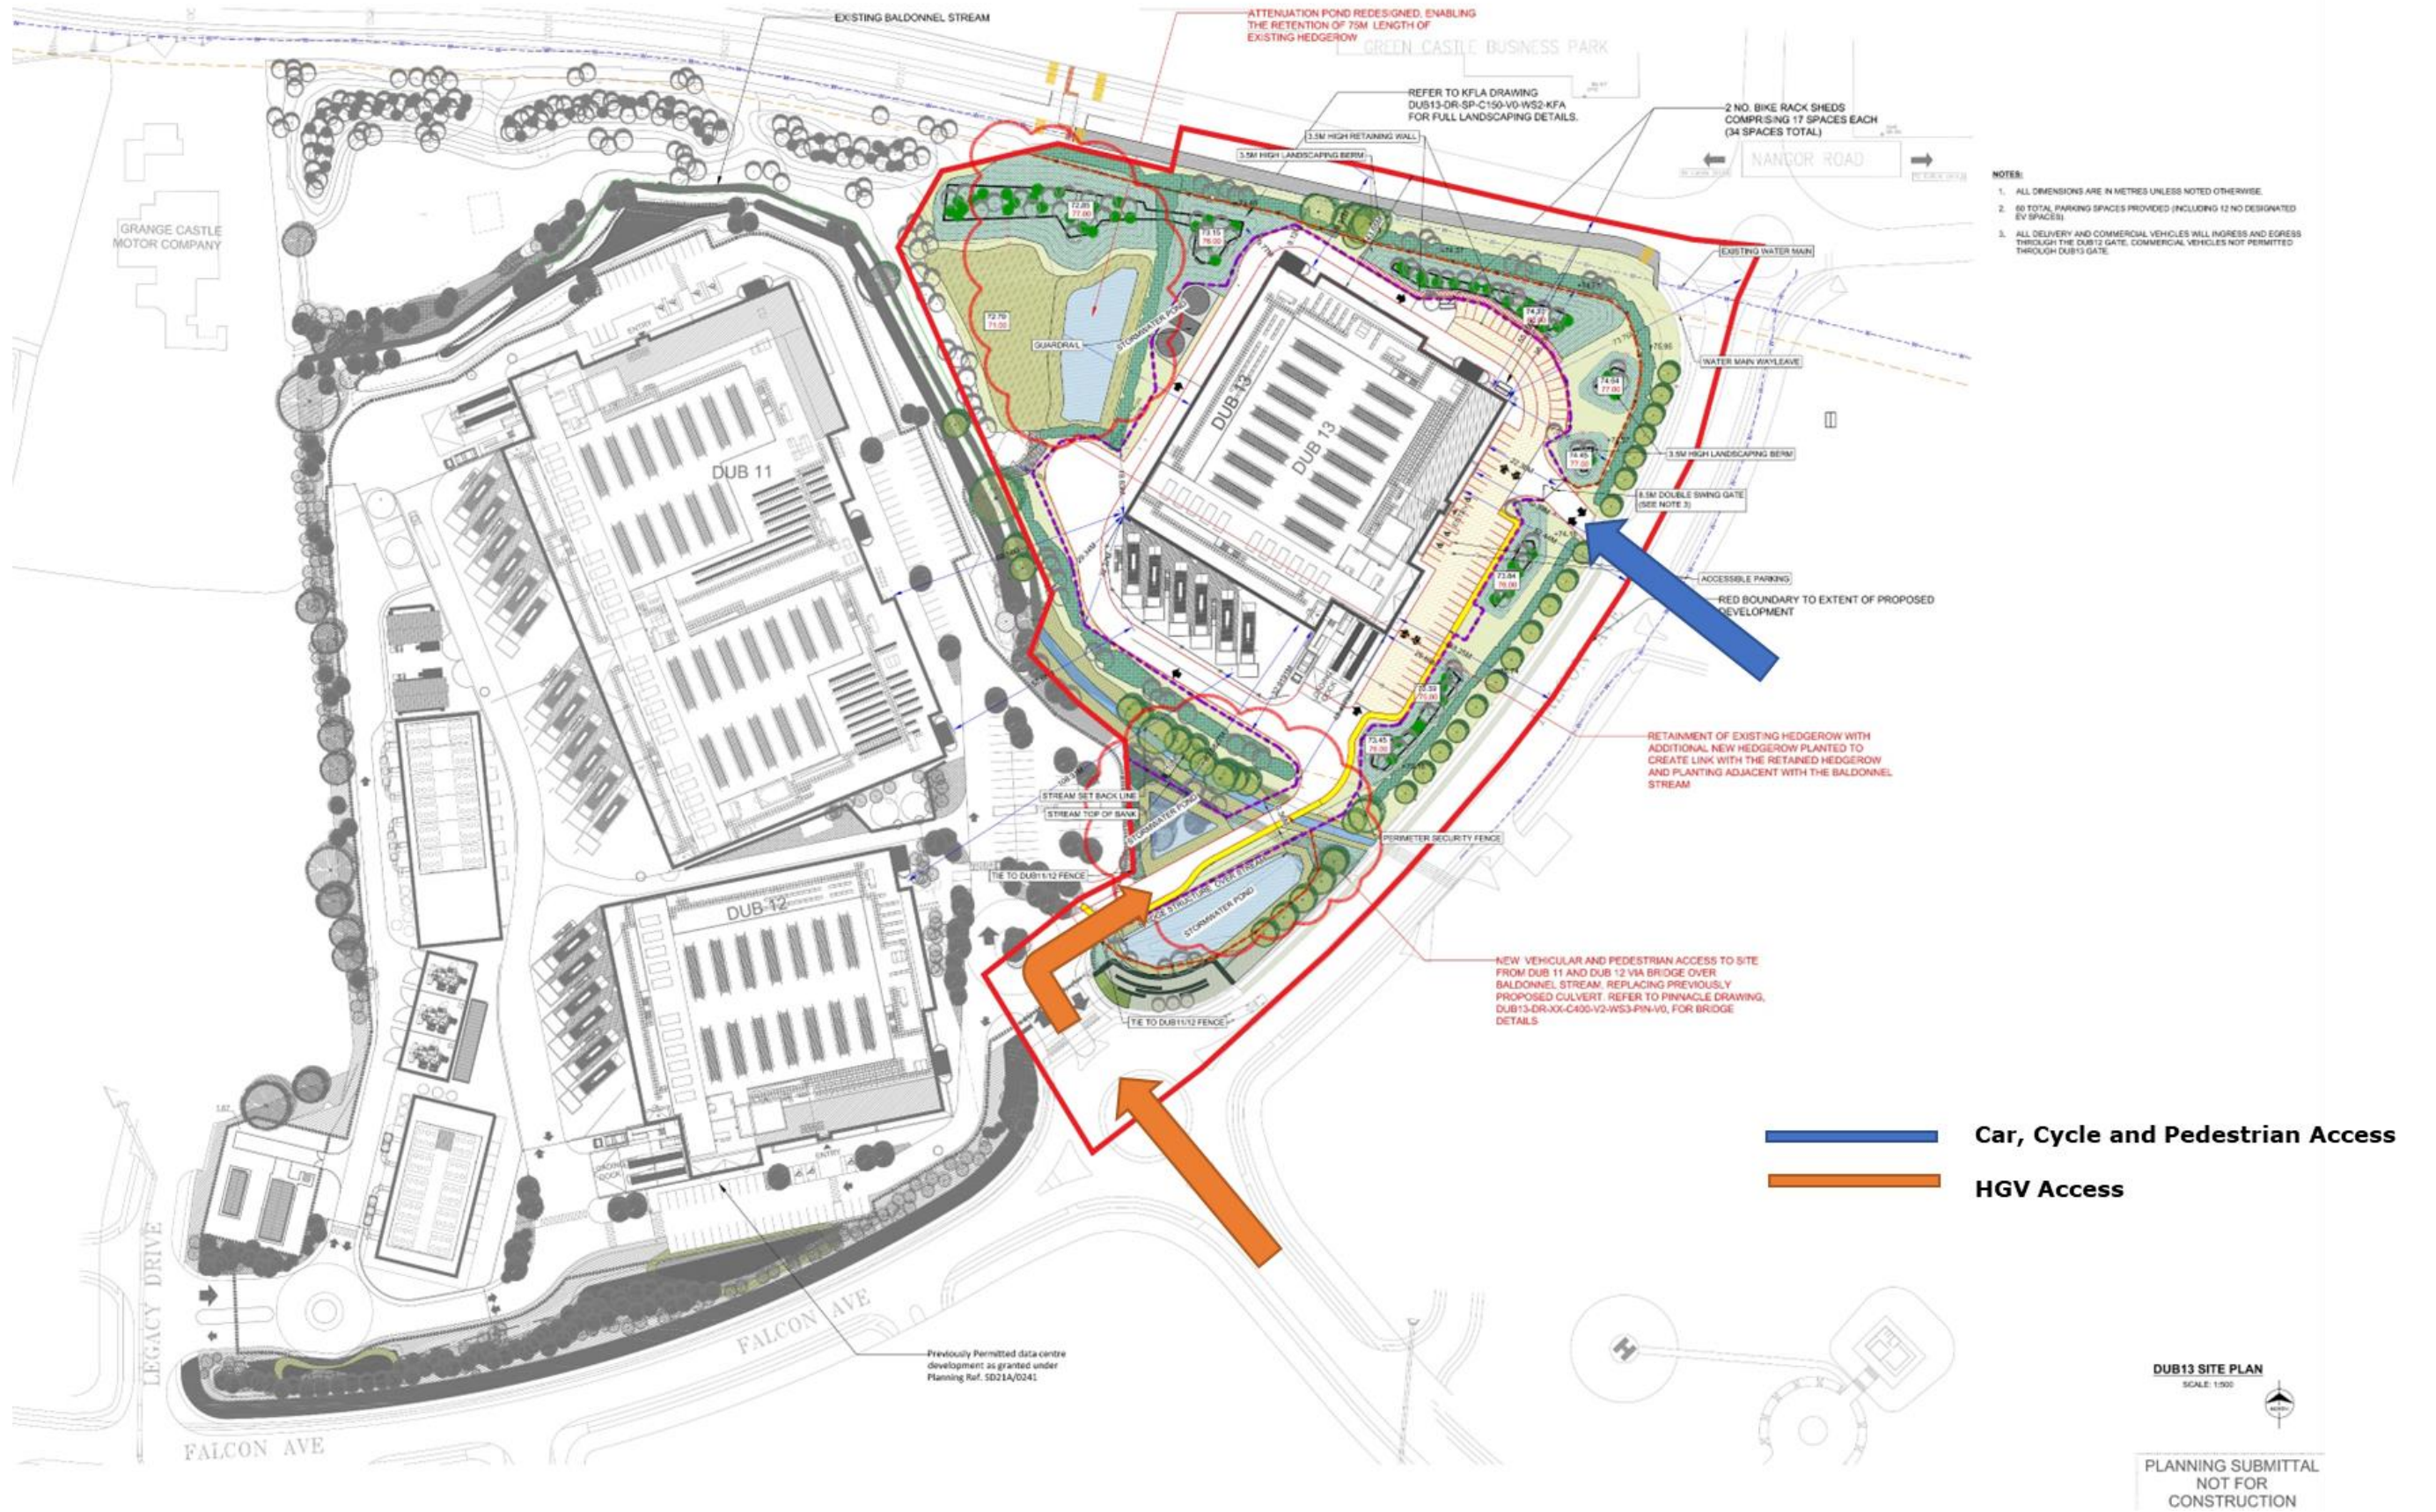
R: Proposed Site Access Arrangement (Source Burns and McDonnell)
